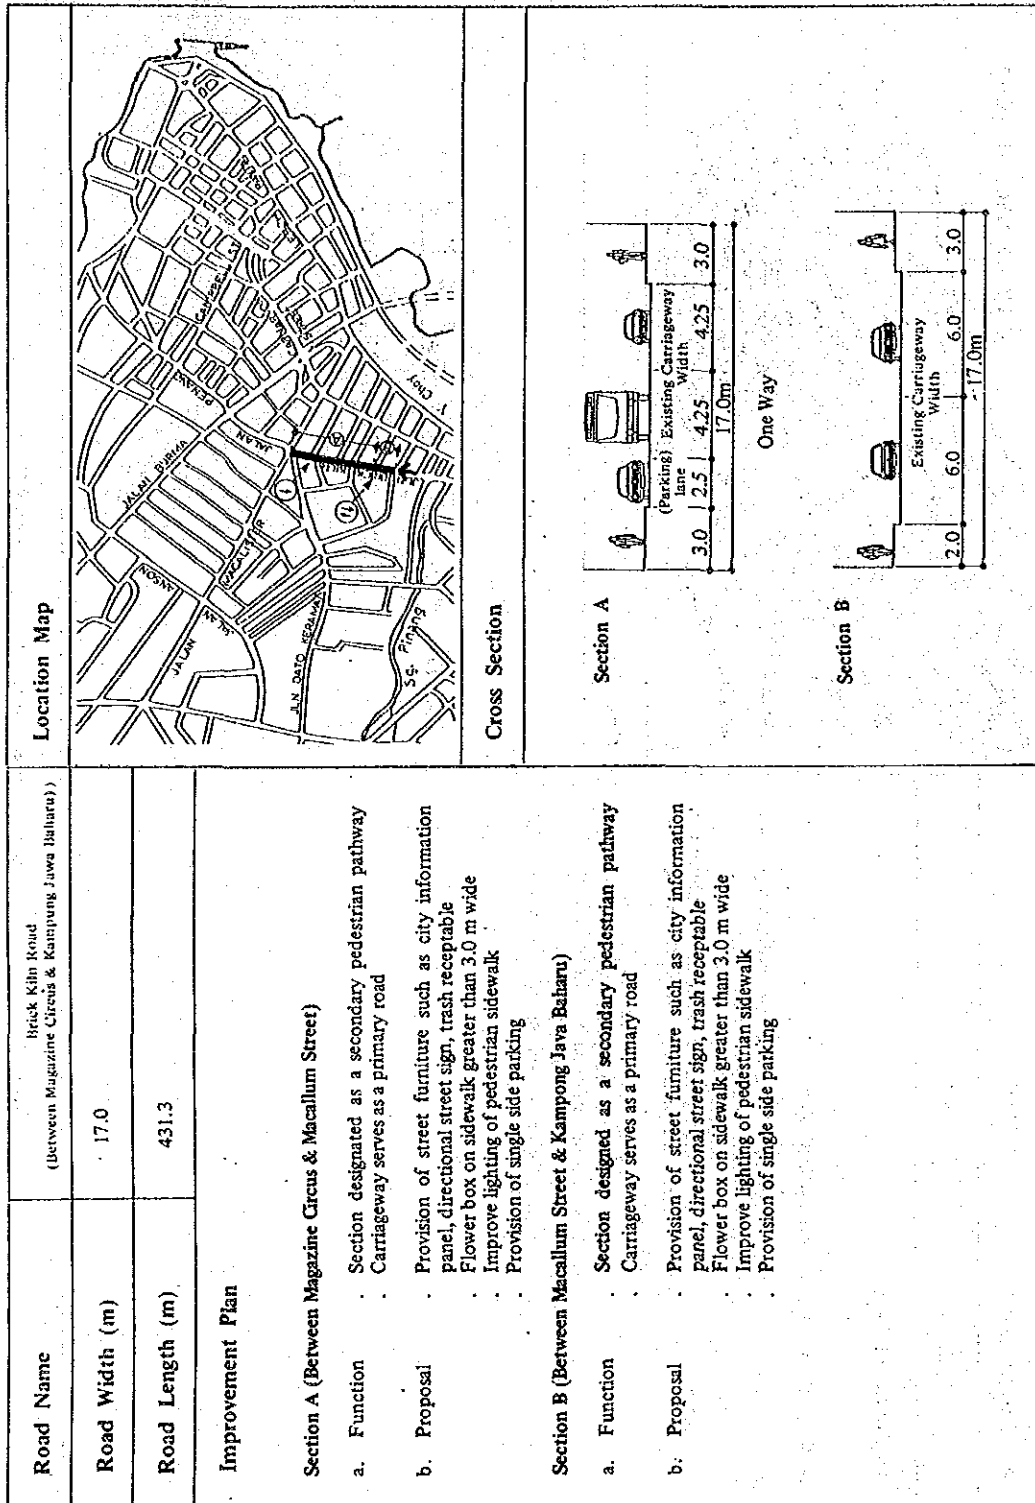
Pedestrianisation Improvement Plan (3) -- Brick Kiln Road
